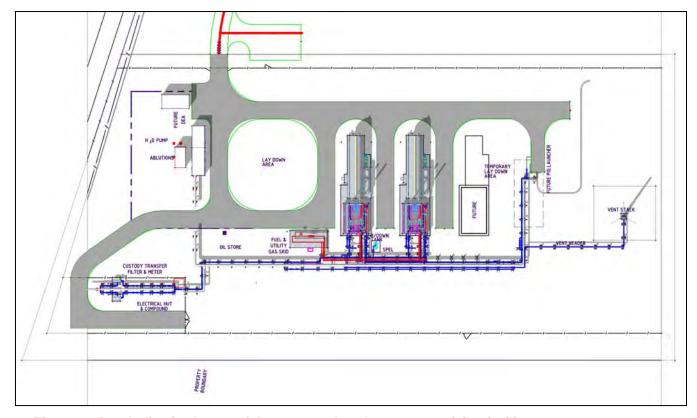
Indicative layout of the proposed onshore gas receiving facility.
